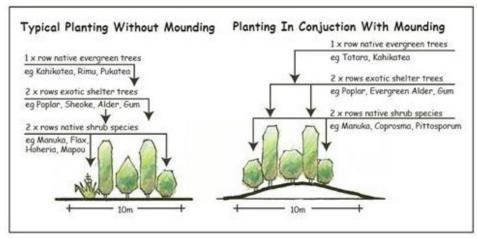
Section 7 Te Puna Business Park Structure Plan - Perimeter Planting Cross Section
